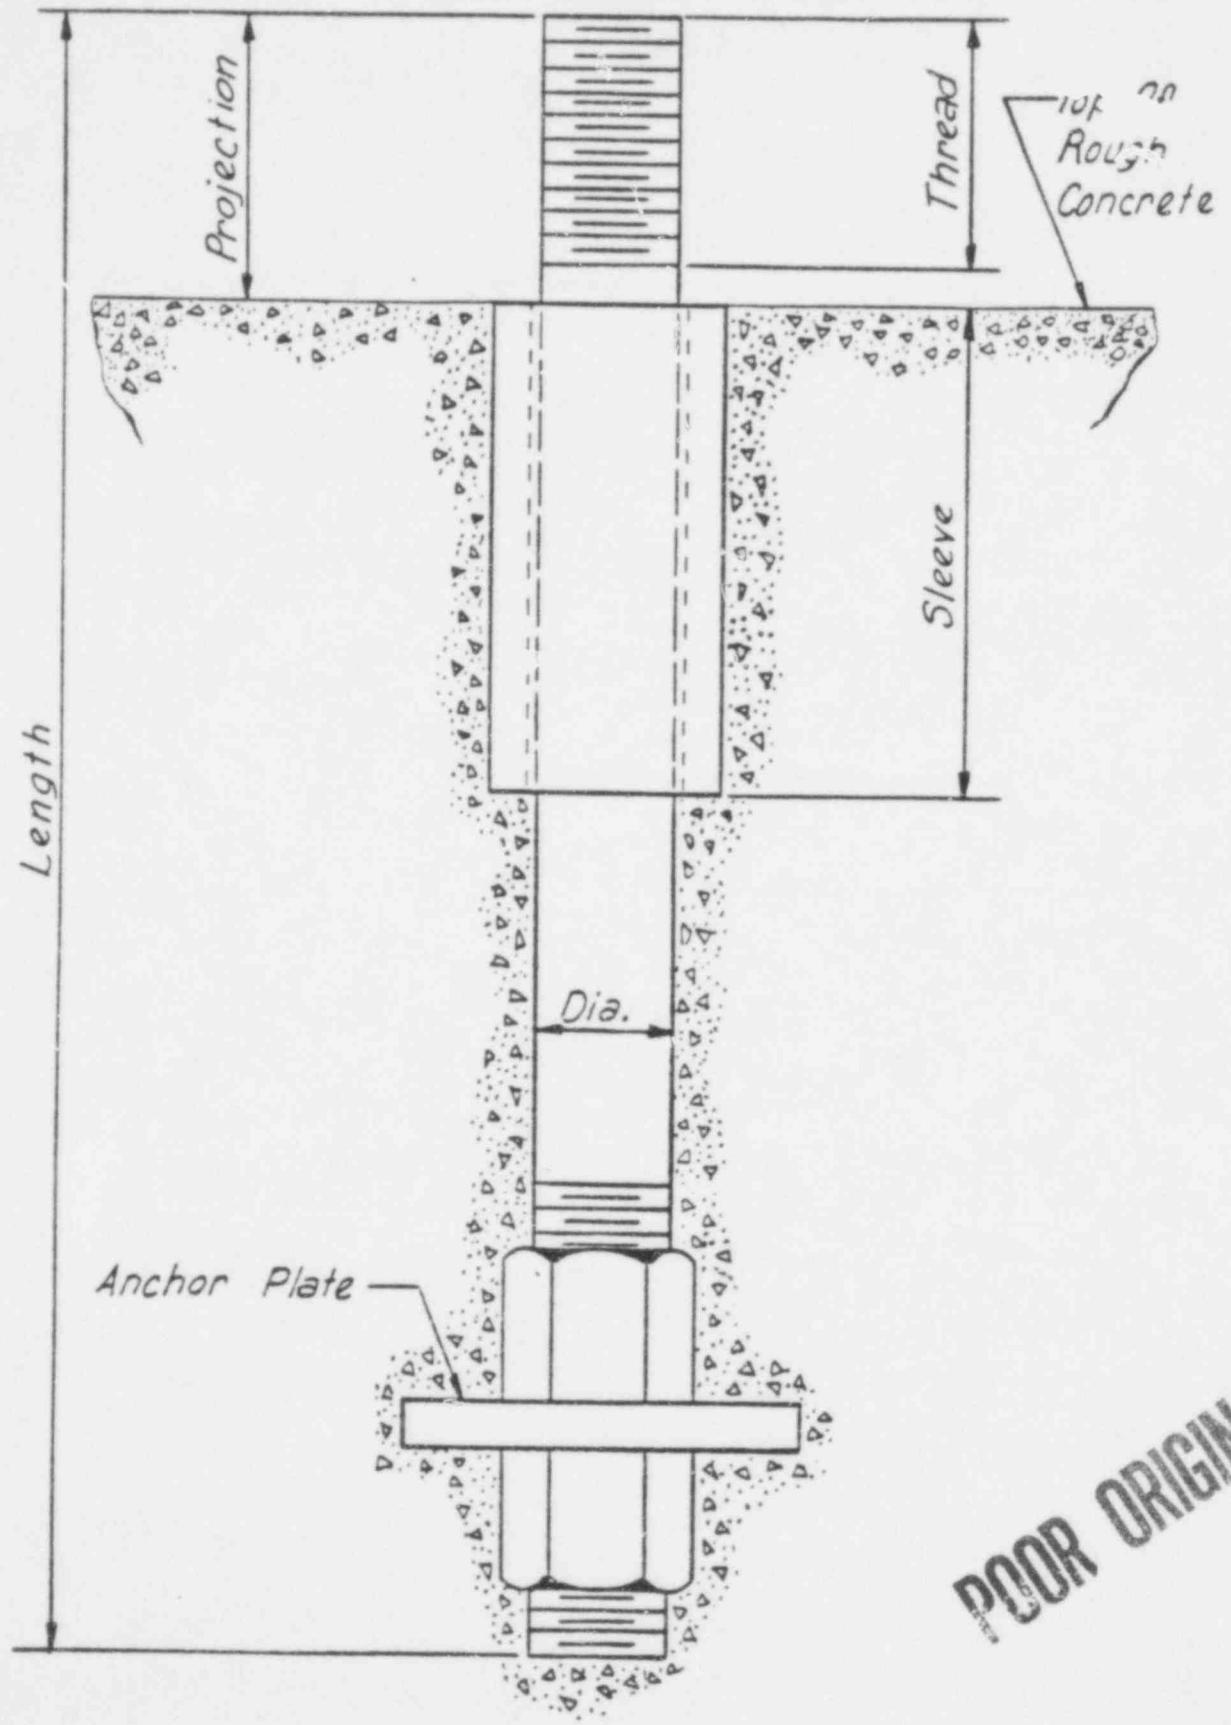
TYPICAL EMBEDDED ANCHOR BOLT DETAIL
